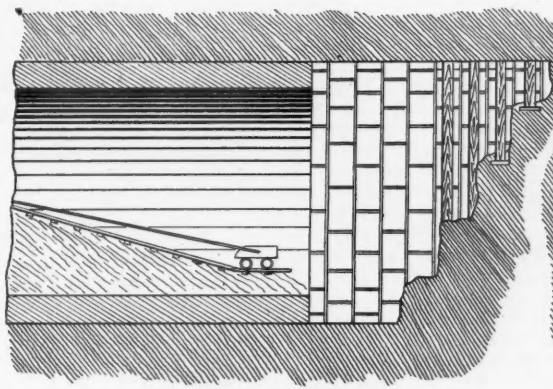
Sections Through Unprotected Heading Showing Crown Sheet Supports Stepped on the Terraces.
